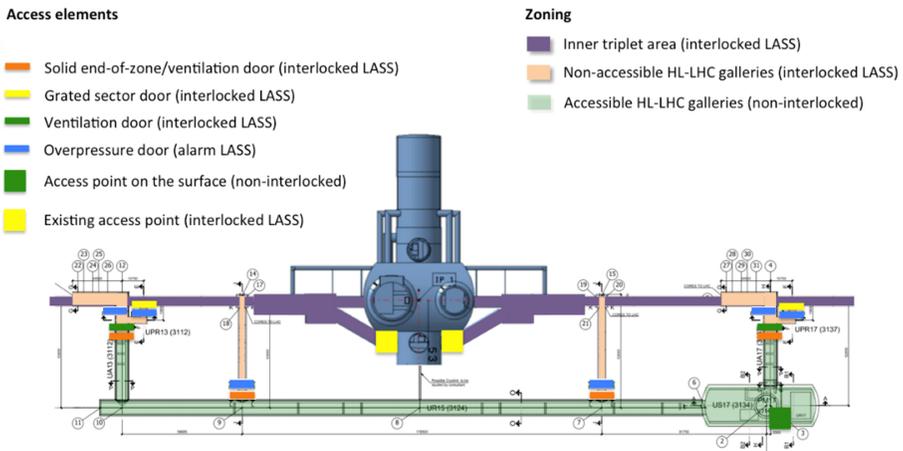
Underground access zoning and access elements at Point 1 (zoning of Point 5 is similar except for existing access point and service tunnel locations).
